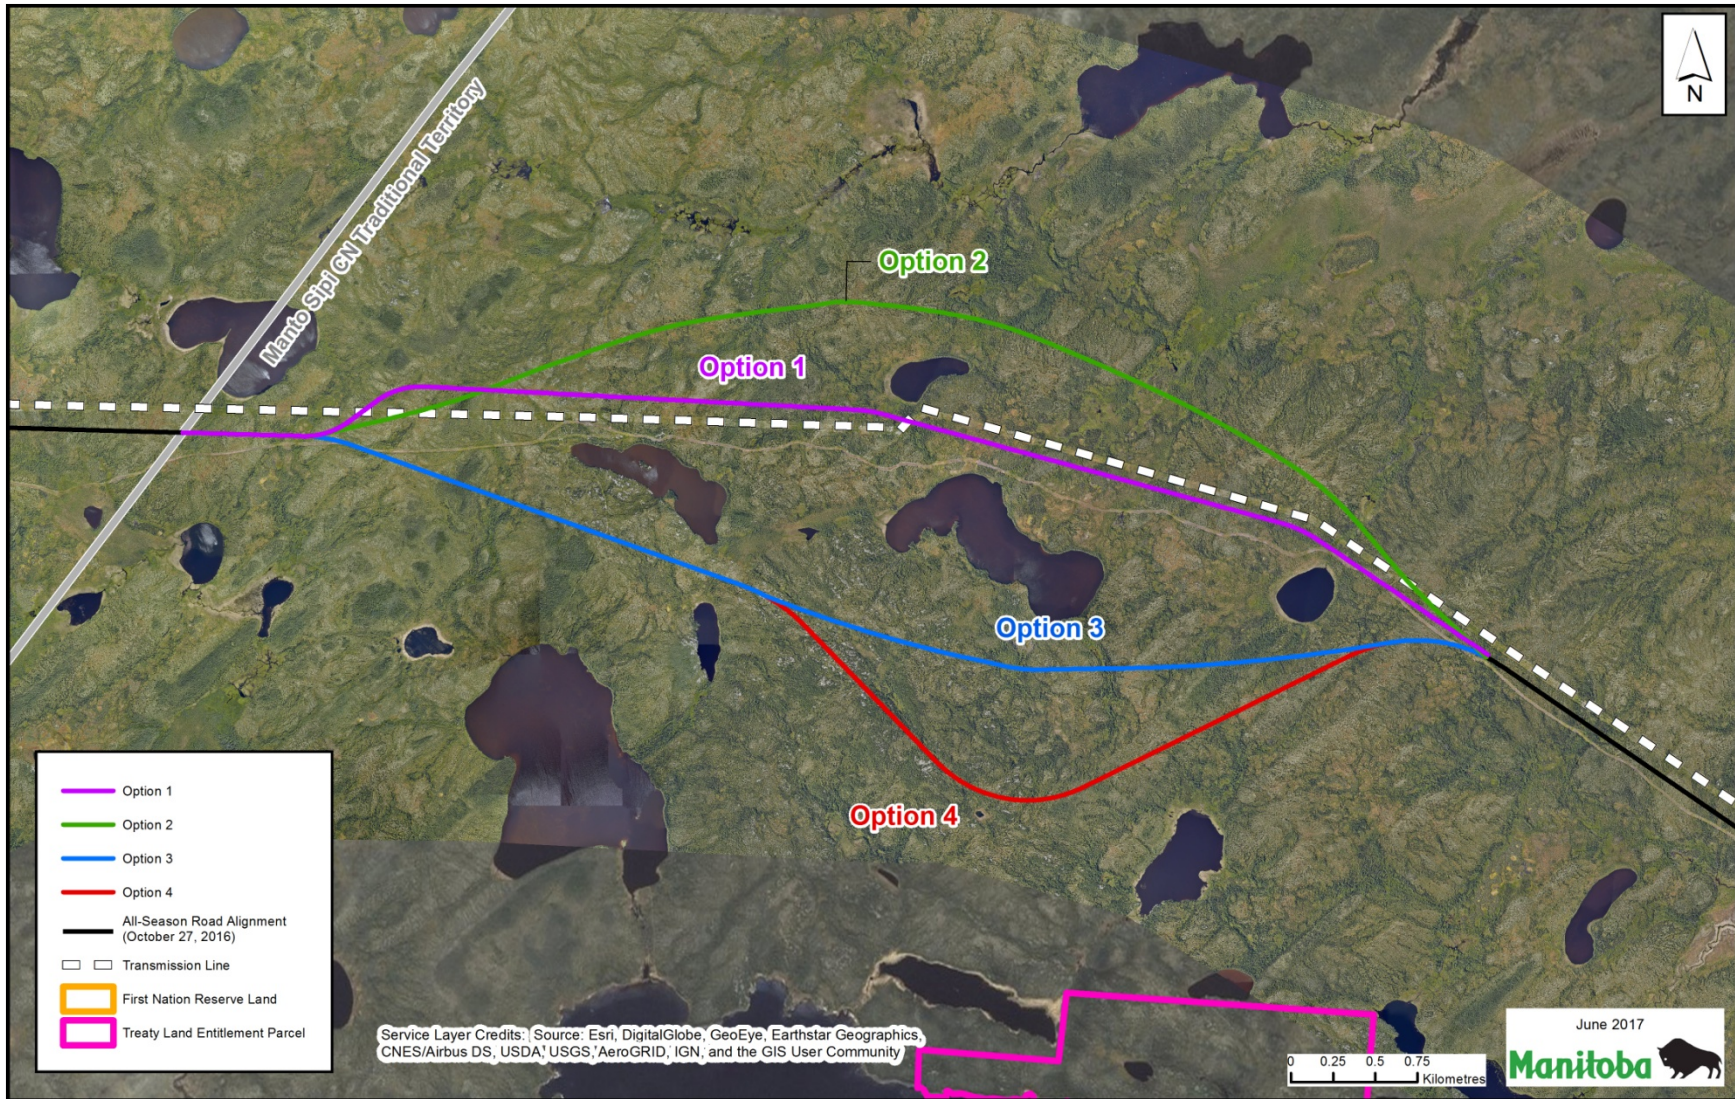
Alignment options for proposed all-season road segment near Manto Sipi Cree Nation
